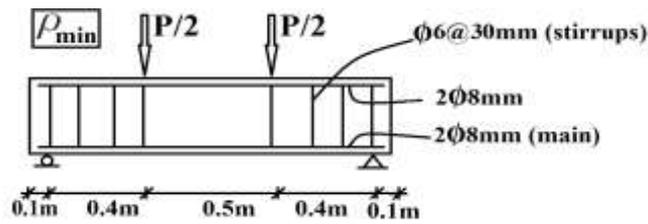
Reinforcement, geometry and loading of the beam 2P-min
